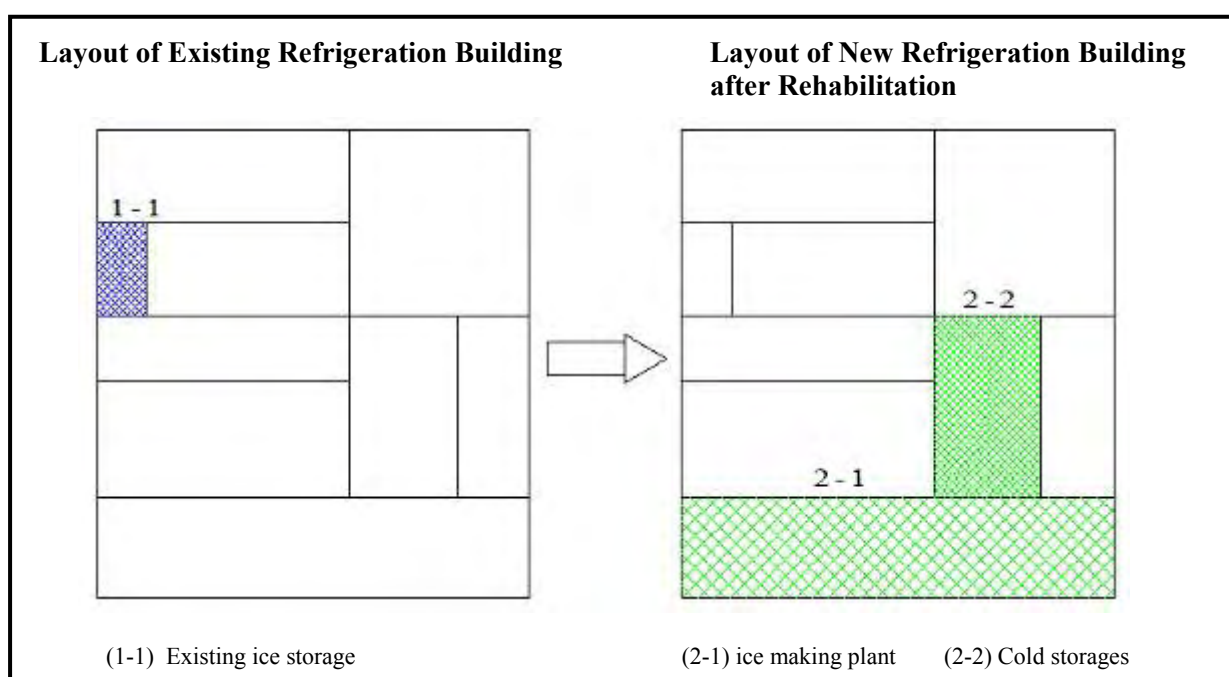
Existing Layout and Proposed Design of Refrigeration Facilities (Camaligan)
